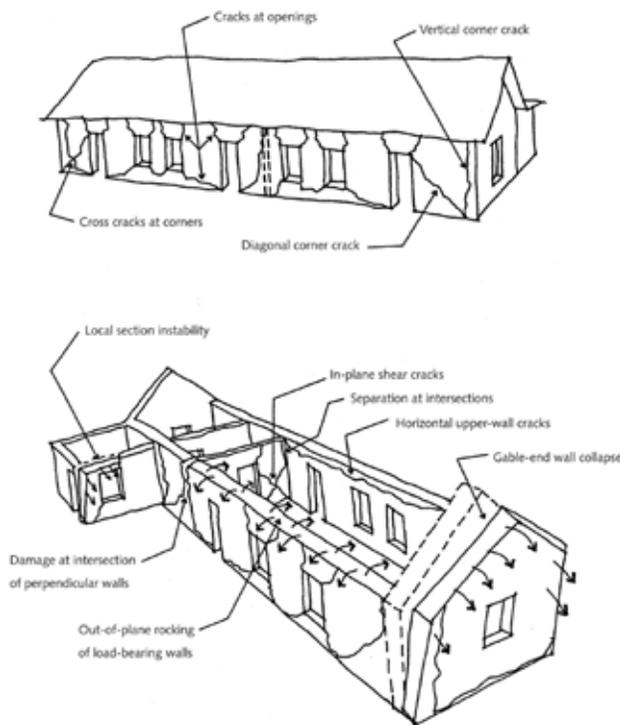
Types of damage observed in historic and older adobe buildings. (Reproduced from Tolles et al. 1996, 20.)
